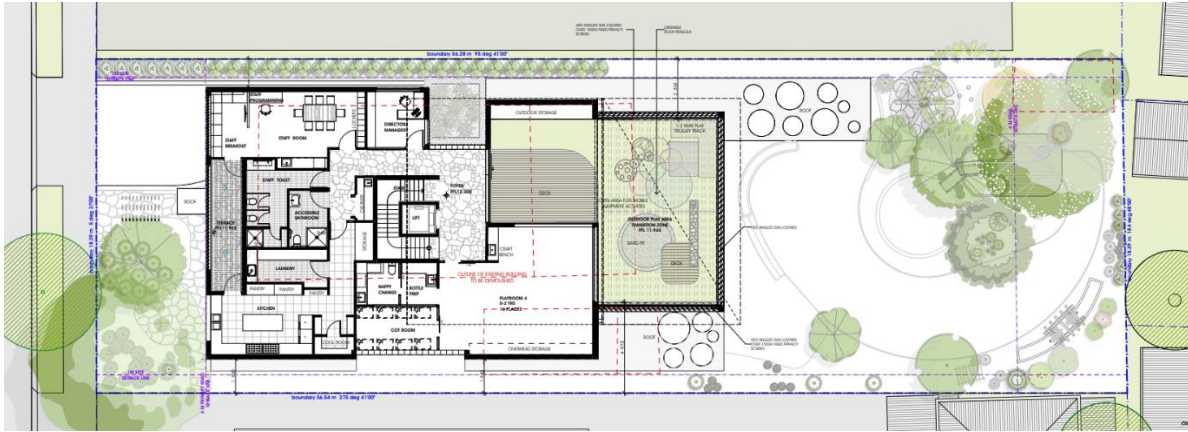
Extract of proposed first floor level (Source: Design Building Group, 2023).
